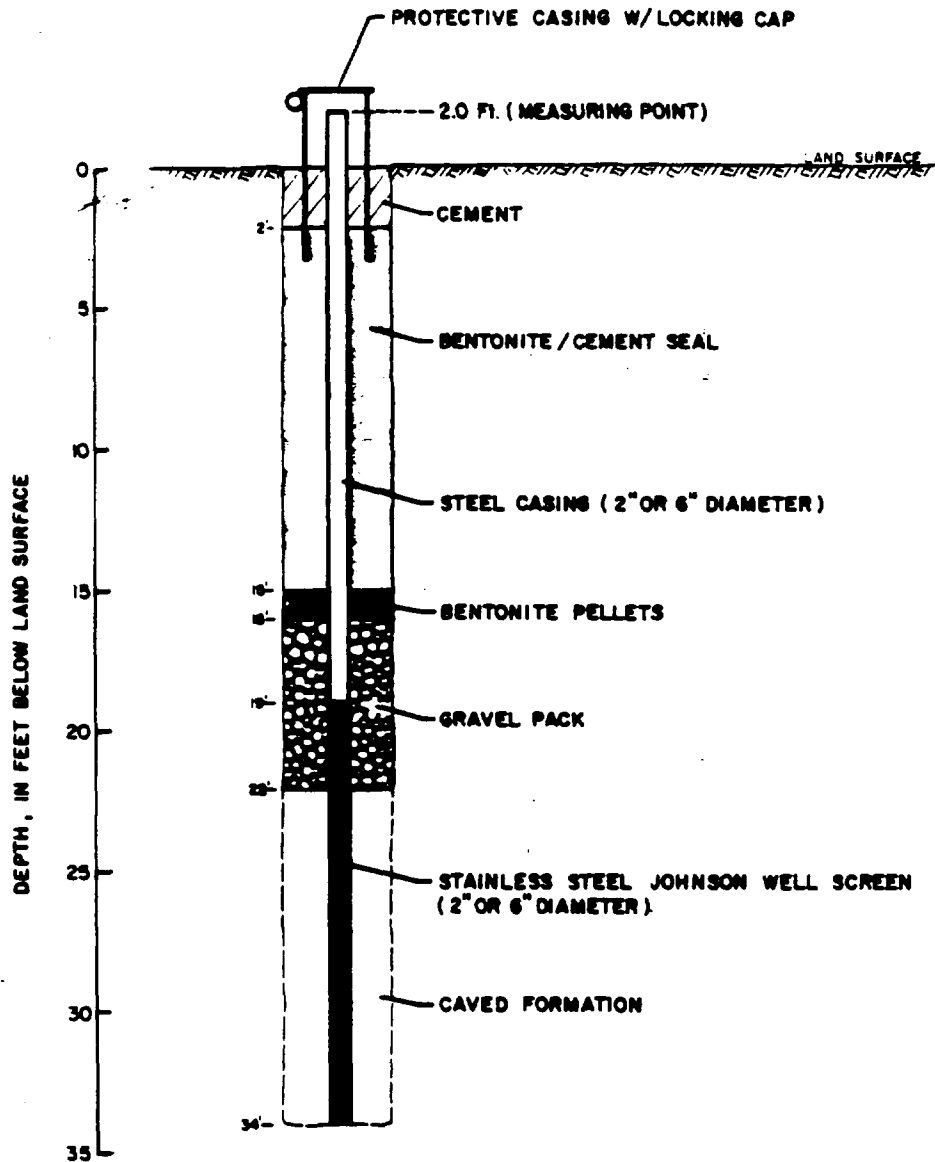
CONSTRUCTION DETAILS FOR 2-INCH AND 6-INCH
